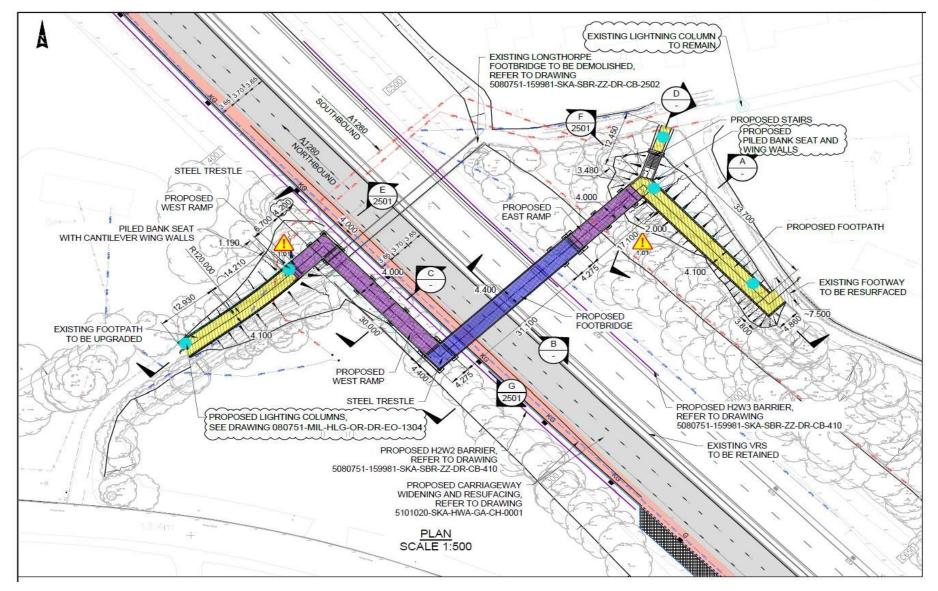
Final Design of the A1260 Nene Parkway Footbridge
